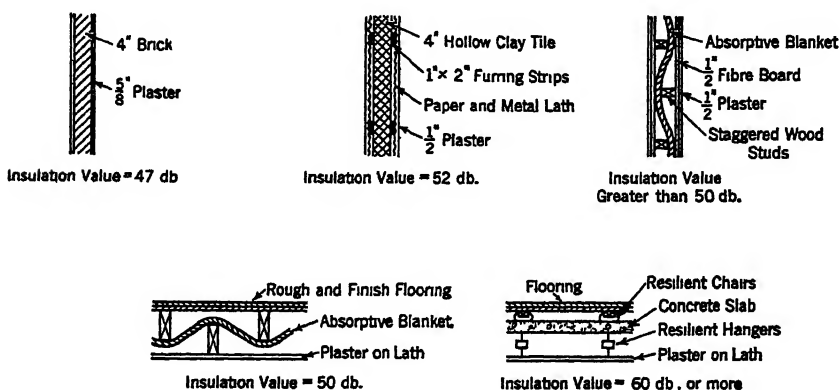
THREE WALL SECTIONS AND TWO FLOOR AND CEILING SECTIONS WHICH ARE SUITABLE FOR THE INSULATION OF EQUIPMENT ROOMS<sup>a</sup>
